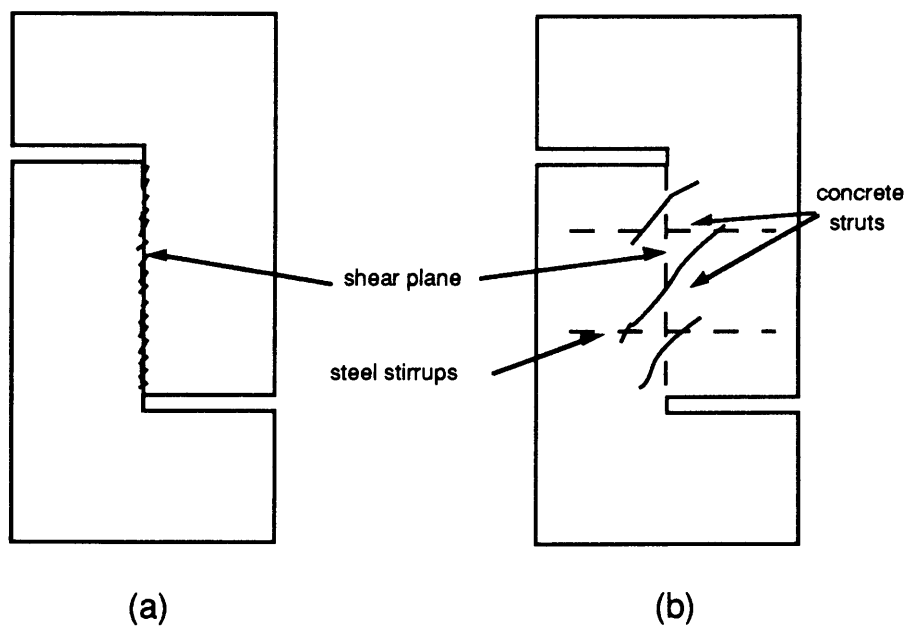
Cracking patterns for push-off specimens: (a) with no steel stirrups crossing the shear plane; (b) with steel stirrups crossing the shear plane.
